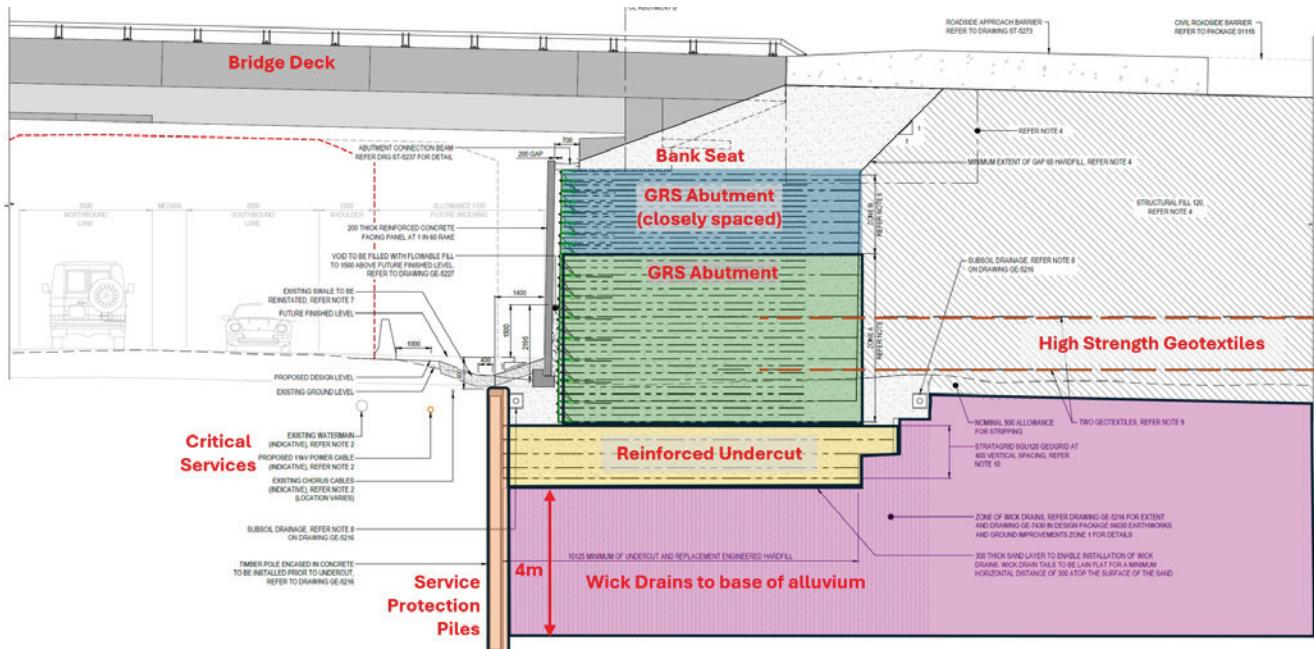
Main components of the GRS Abutments for Bridge 2 – eastern abutment shown
